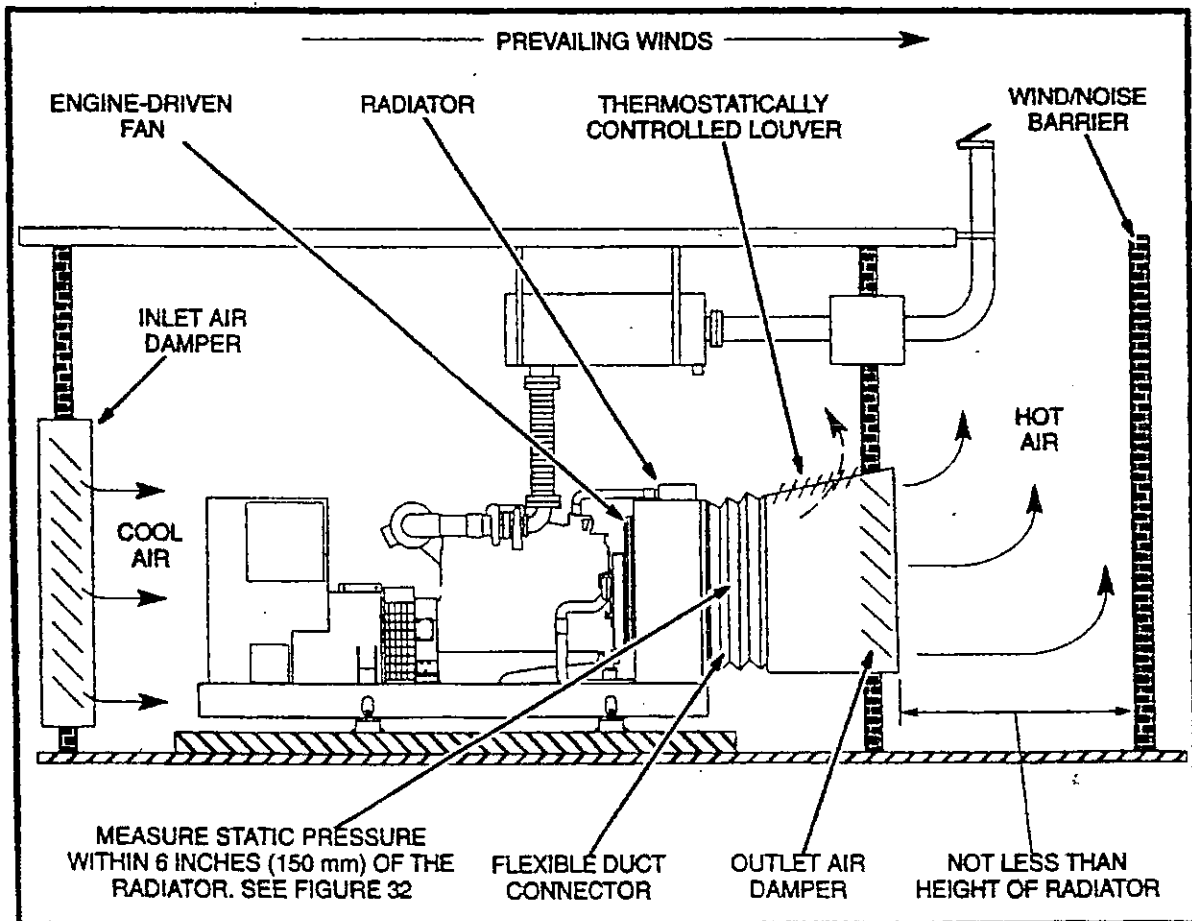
FACTORY-MOUNTED RADIATOR COOLING
